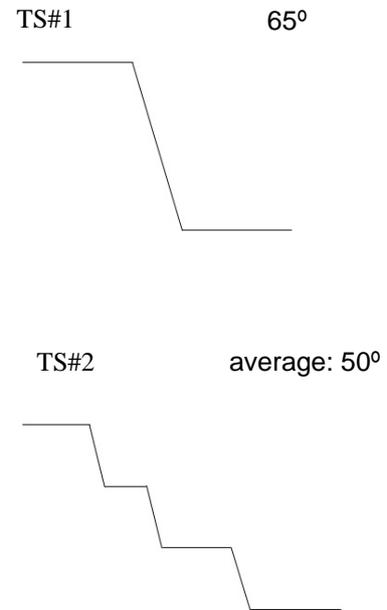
Sections corresponding to Test Site #1 (top) and Test Site #2 (bottom). Each bench is approximately 12-13m high.
